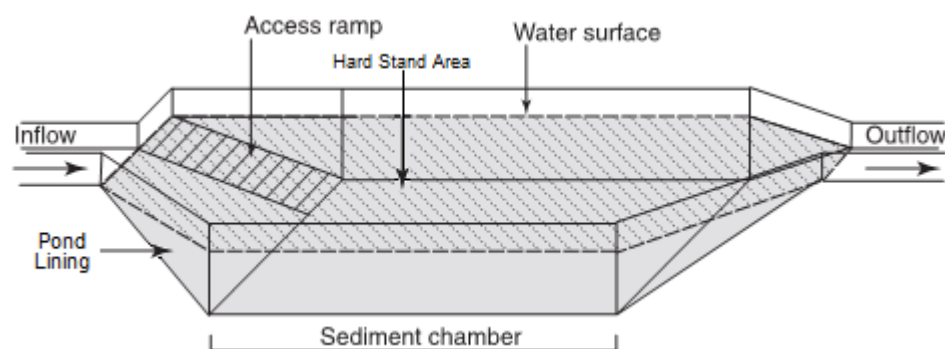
Typical Inlet Pond Schematic (Ref. 15)
